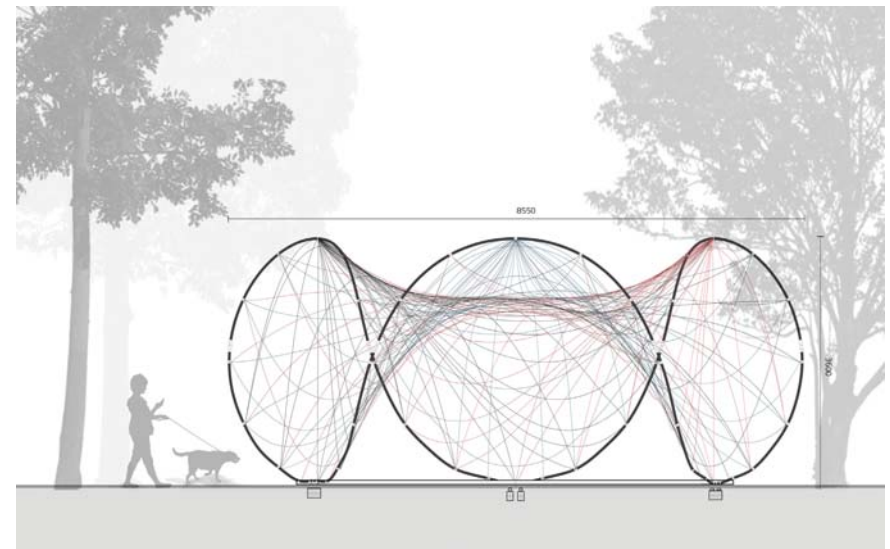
\_3: Architectural drawing. South elevation. (Source: Jingcheng Chen, Olga Kalina )
